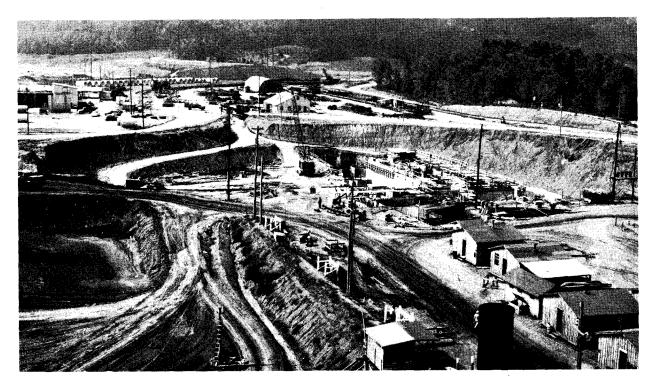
Early stages of excavation and substructure concreting. Service bay excavation at left and intake structure at right. Note 76-inch id (units 1-4) concrete pipe conduit stock piled in background. Units 5-9 used 96-inch id concrete pipe conduit.
